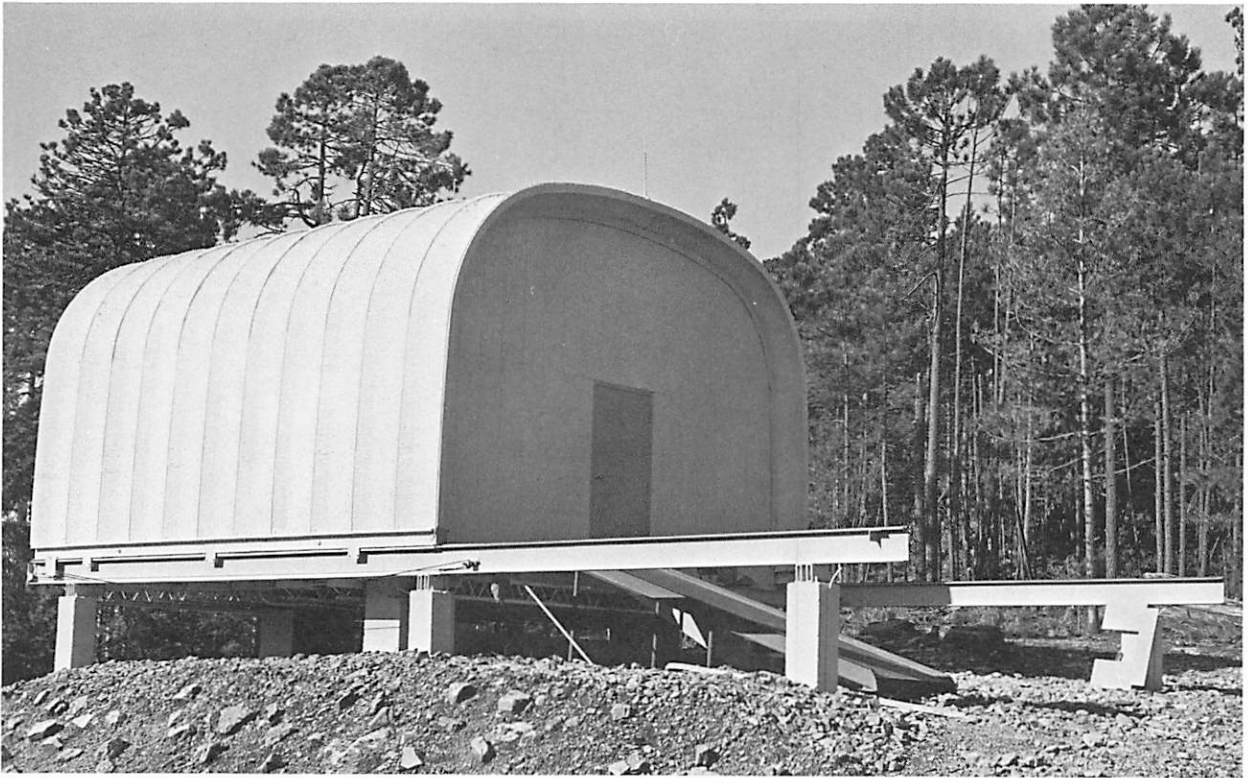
The roll-off-roof building which houses the 28-inch telescope. The south wall of the building (at left) is hinged and folds down for observations of southern stars.
